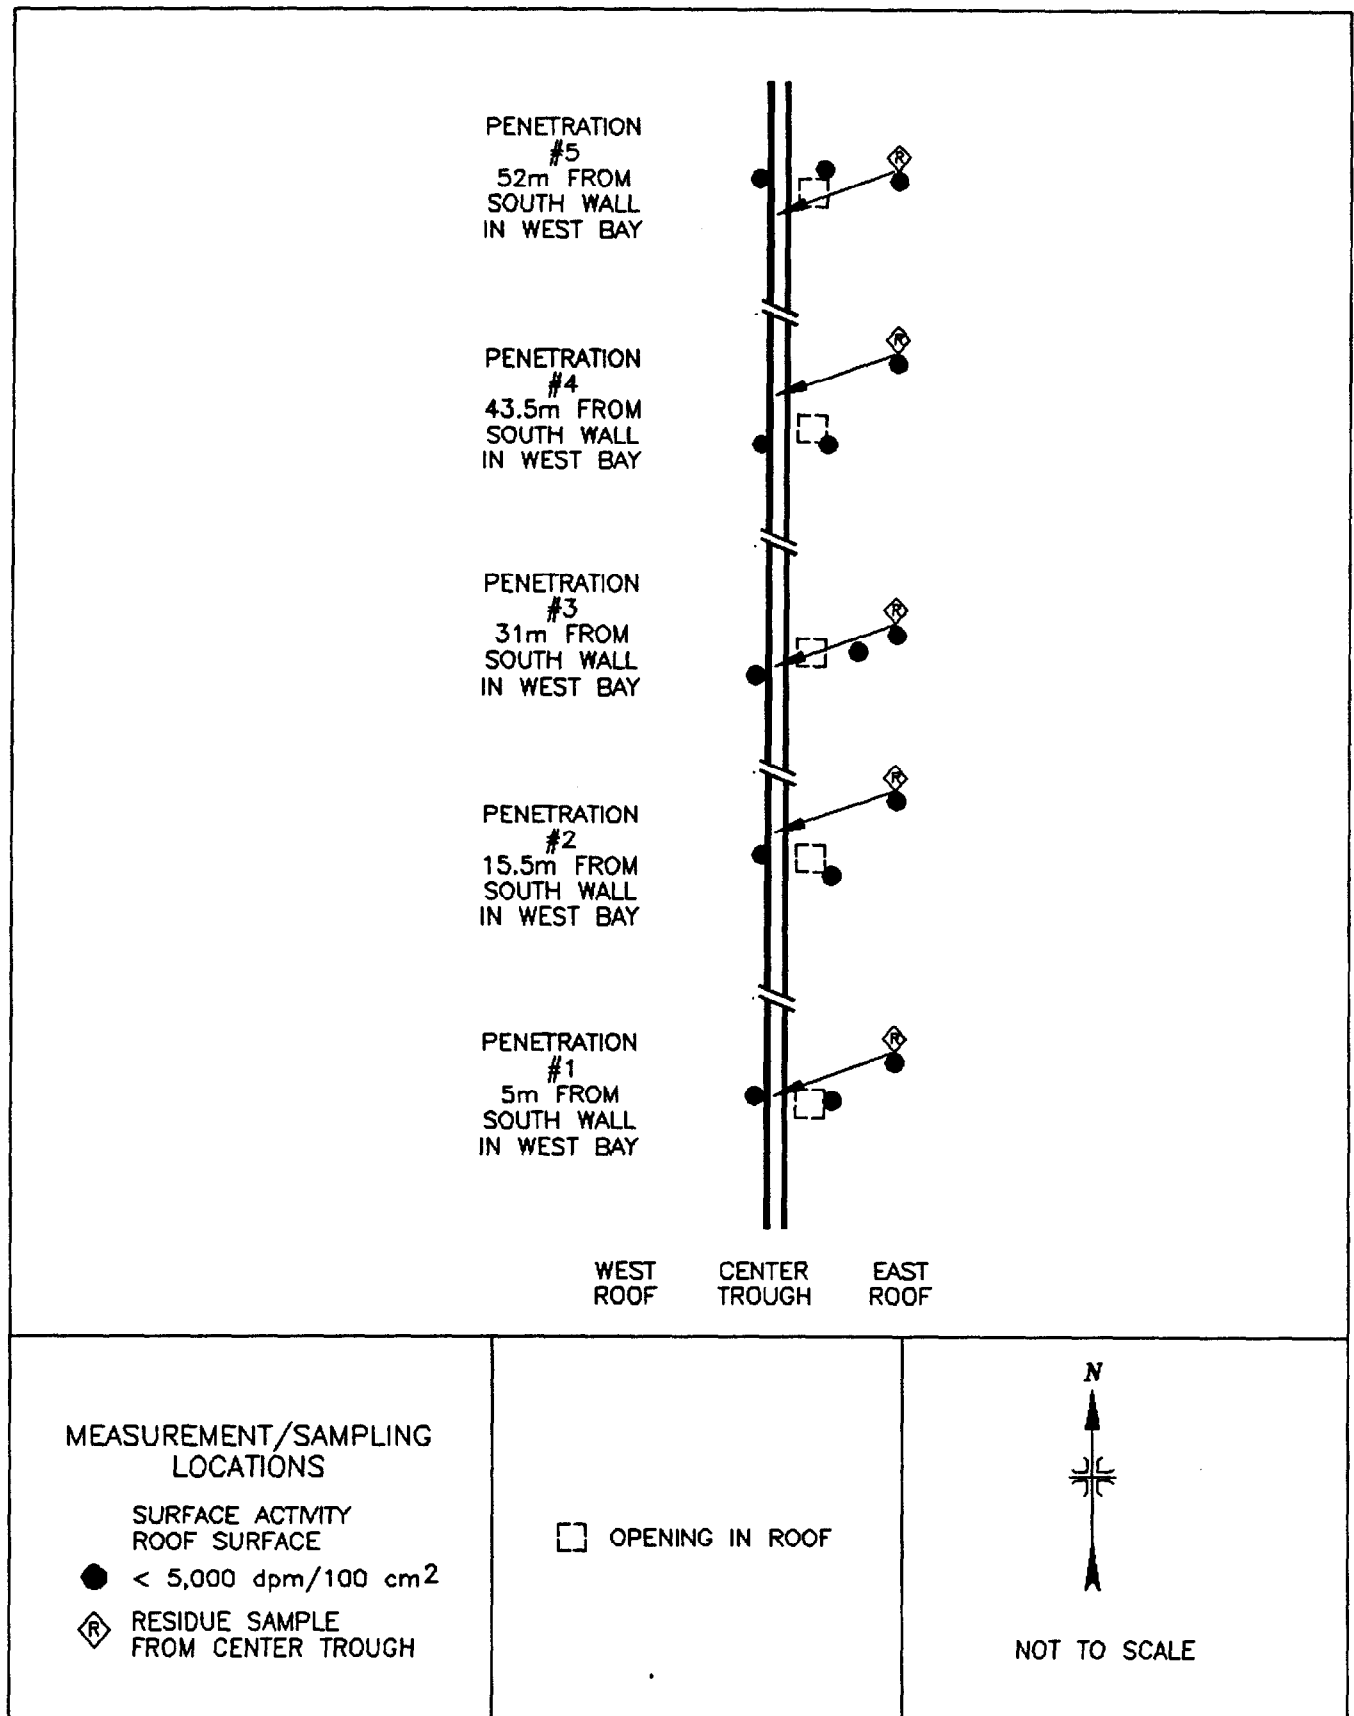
Building 3, Roof Penetrations – Measurement and Sampling Locations
